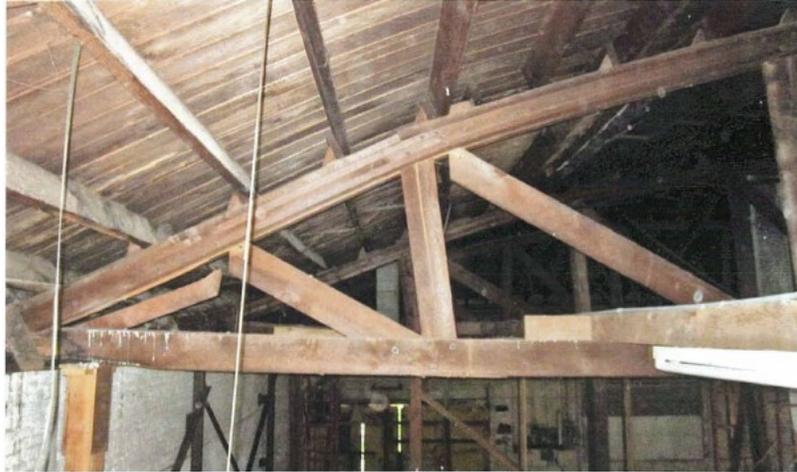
Interior detail of C.P. Stephens building broken trusses requiring stabilization. Photo credit City of Phoenix Historic Preservation Office.
